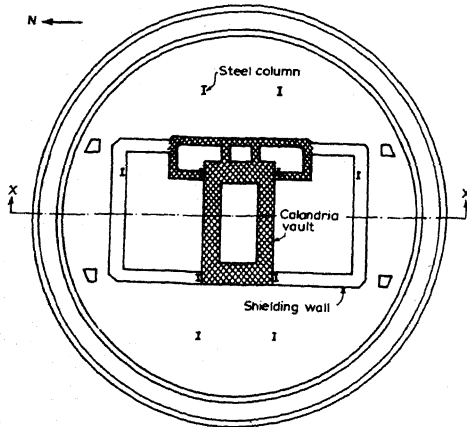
PLAN AT EL 9550 OF ORIGINAL STRUCTURE
